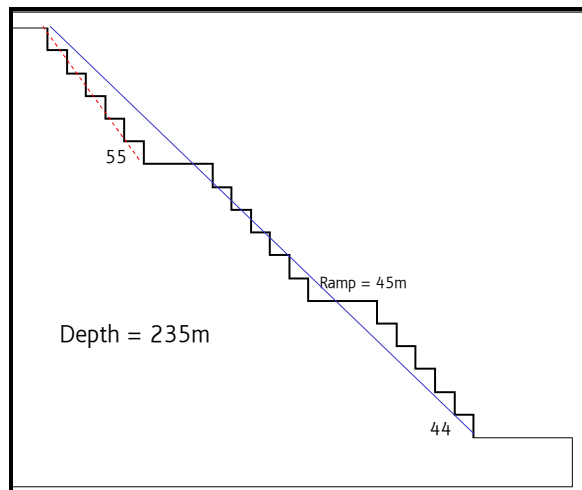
Conservative 2004 slope design for Sandsloot west wall
